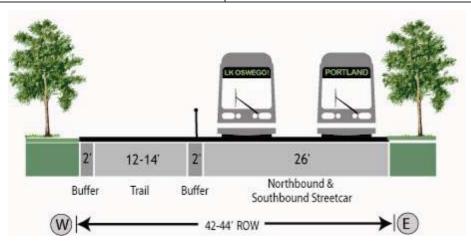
Section 1.9a Willamette Shore Line with Double-track Streetcar
